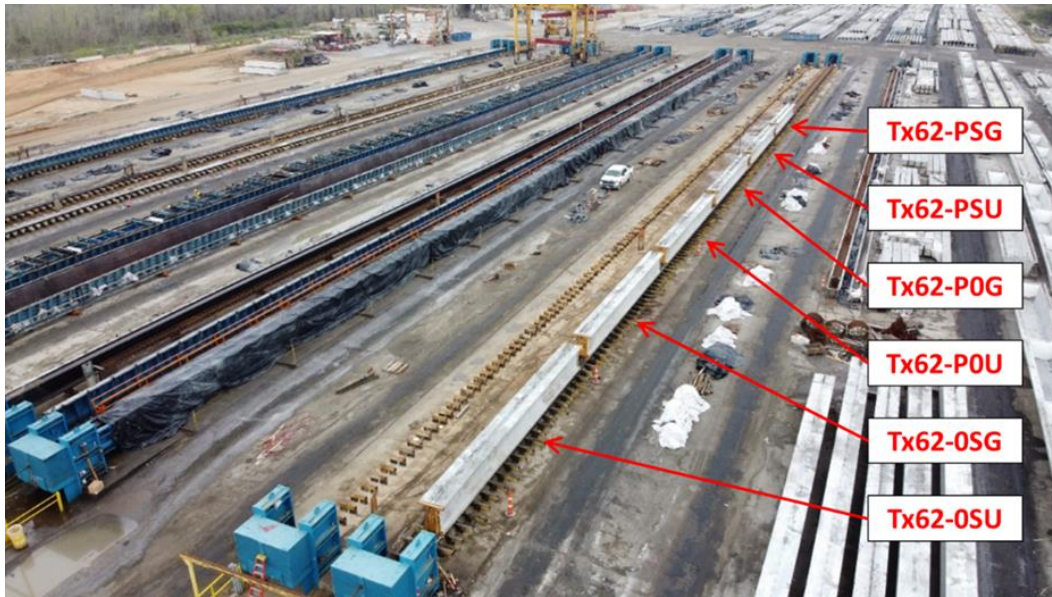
Completion of Production for Prestressed Girders at the Precast Plant
